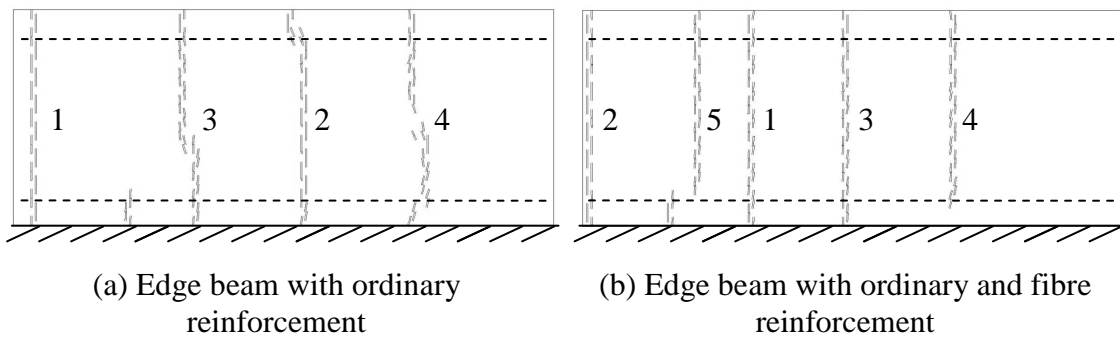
Crack patterns of 100 % open cracks at  $\epsilon_{cs} = 1 \text{ ‰}$  for edge beams with cross-section 1 with ordinary and fibre reinforcement.
